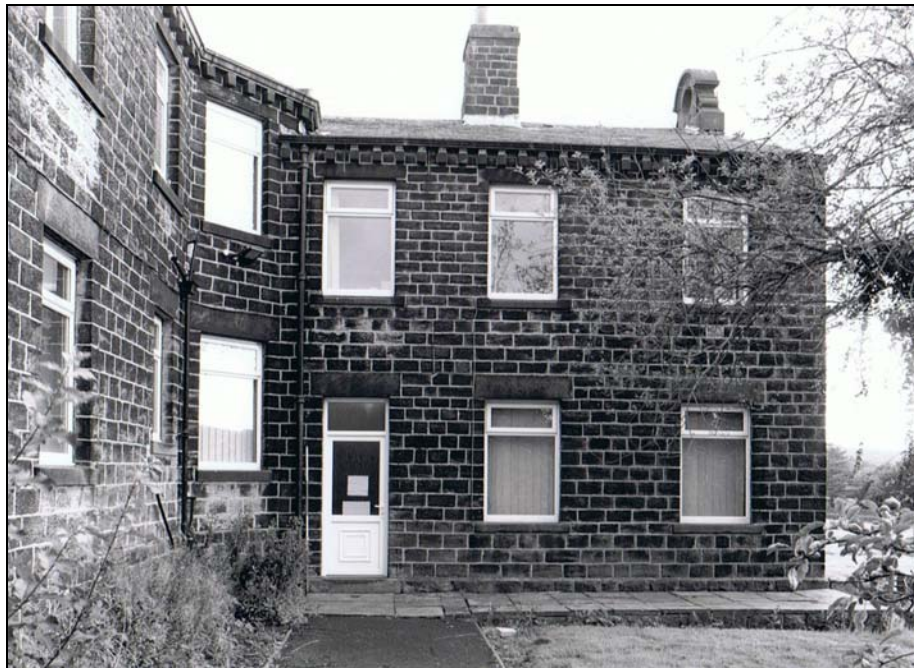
general view of the South-west Wing, south-east elevation, from the south south-west
